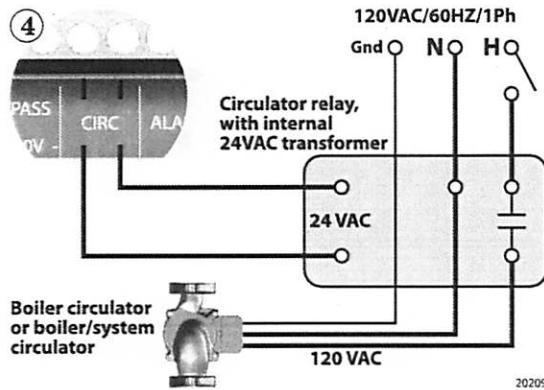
Wiring the boiler circulator using a relay or starter (required for motors over 1/4 hp)
